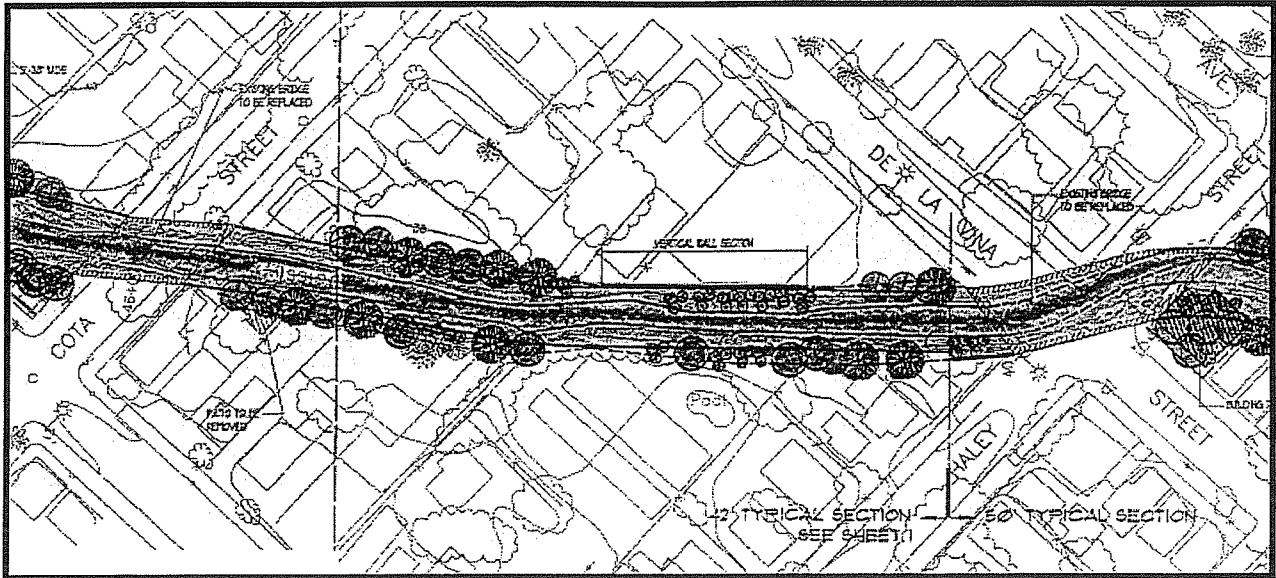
Cota Street Bridge to Haley-De la Vina Bridge
